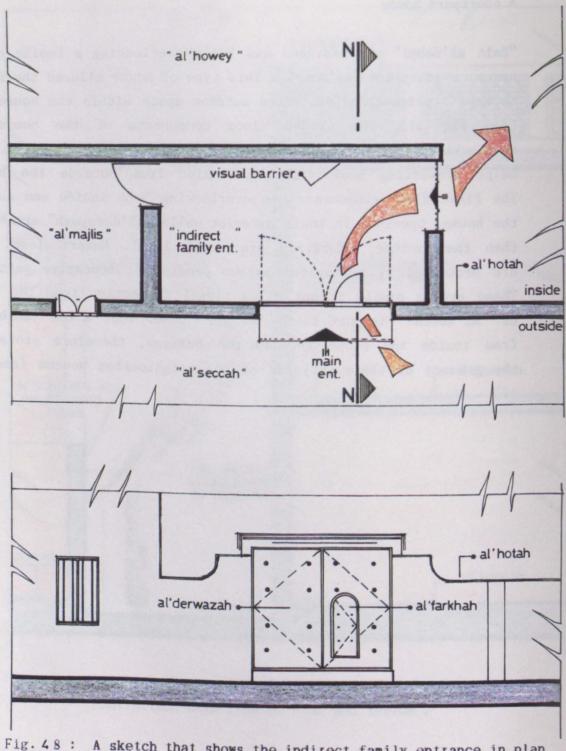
A sketch that shows the indirect family entrance in plan and in elevation
